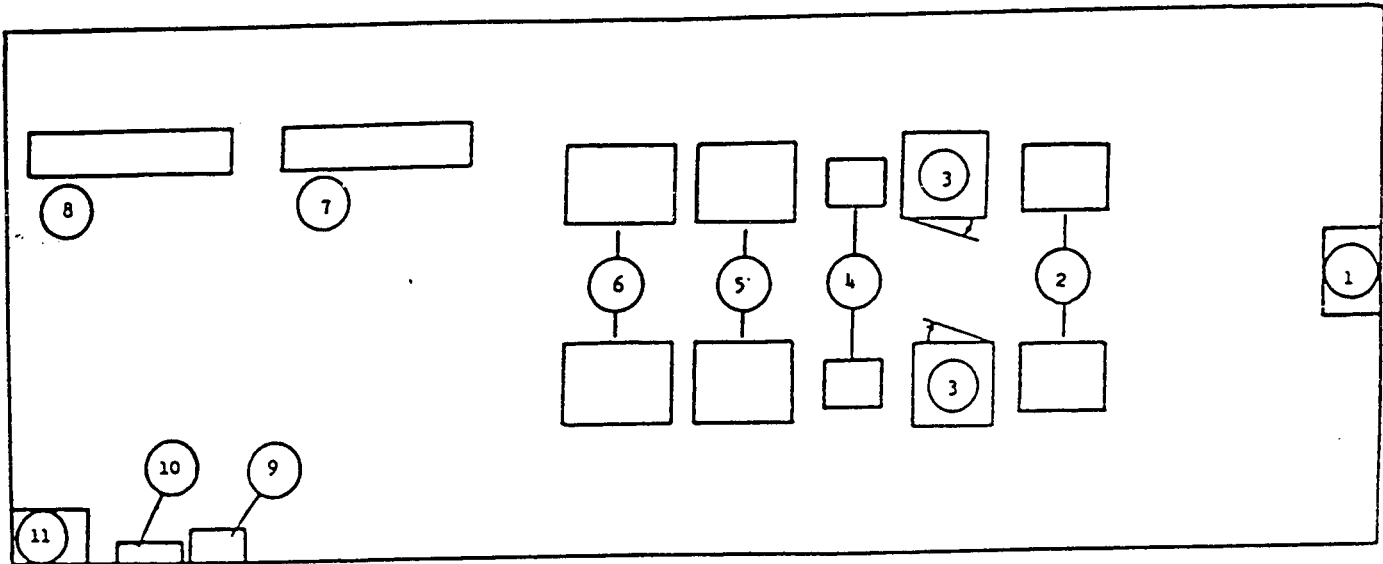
TYPICAL ARSR SITE EQUIPMENT LAYOUT
